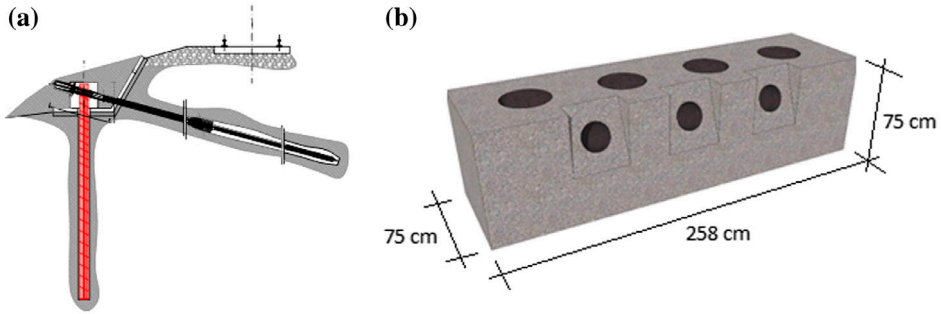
(a) Schematic view of the slope stabilising piles reinforced with a pre-stressed ground anchor; (b) precast FRC beam.
